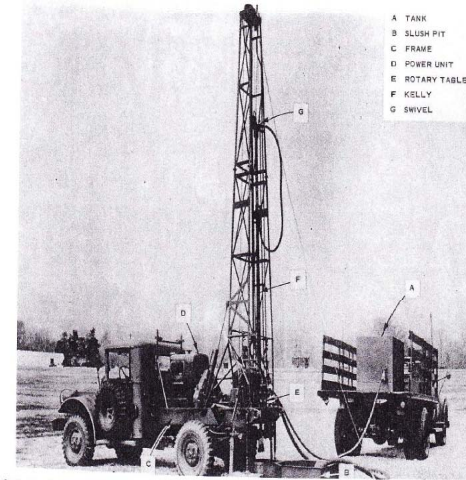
Truck-Mounted Rotary Drill Rig with a Chain-Feed Drive System
